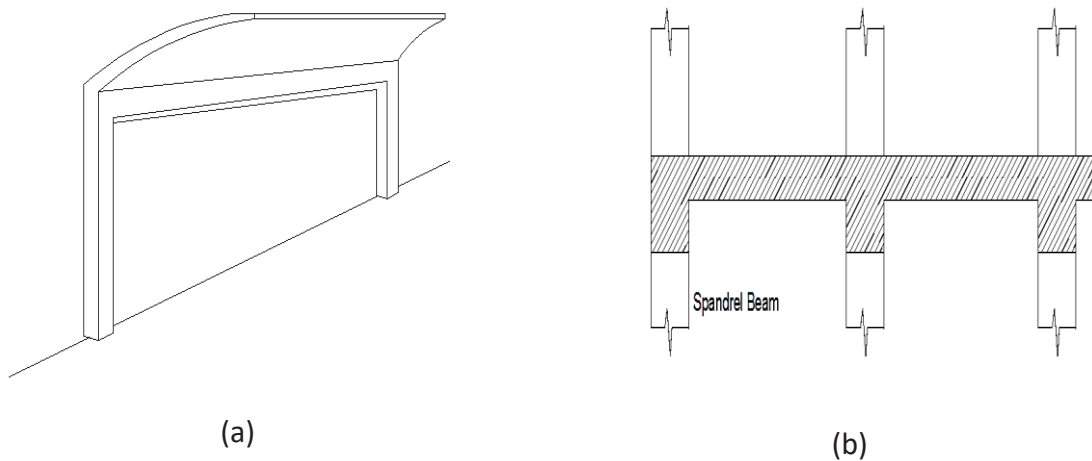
(a) Cantilever canopy, (b) Spandrel beam (Ghoeim, Mihilmy, 2008)
